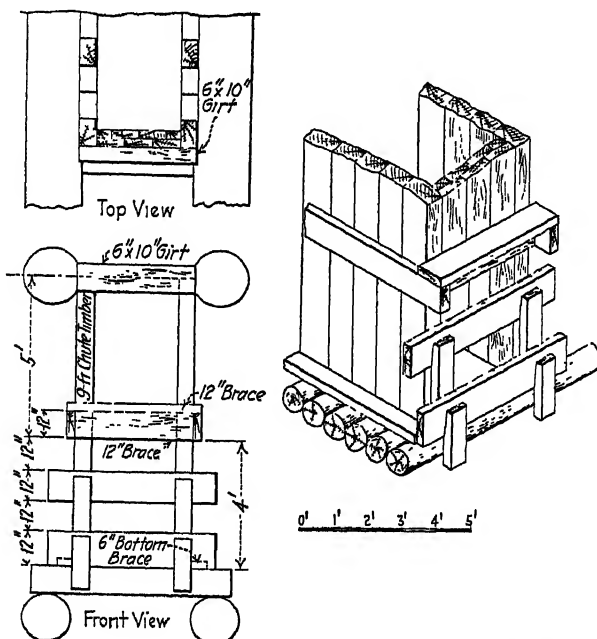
DETAILS OF DRAW CHUTE, HECLA MINE.
